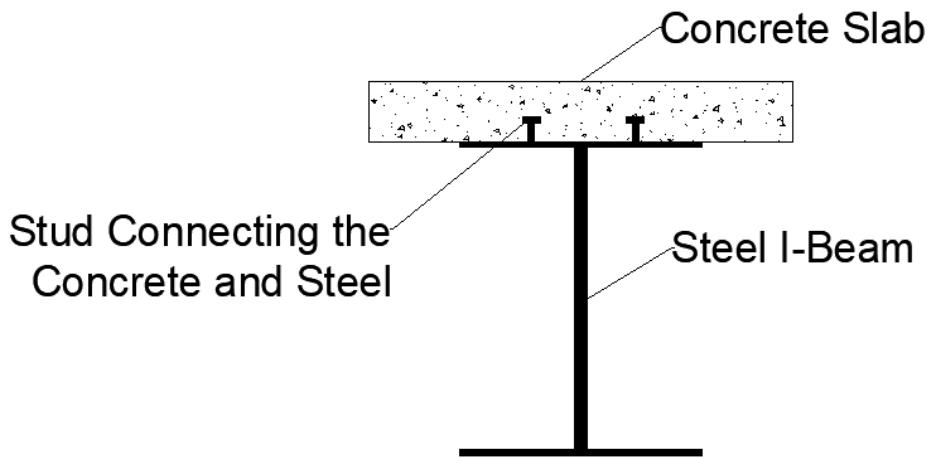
Cross section of a typical composite beam (Devlin, 2023).
